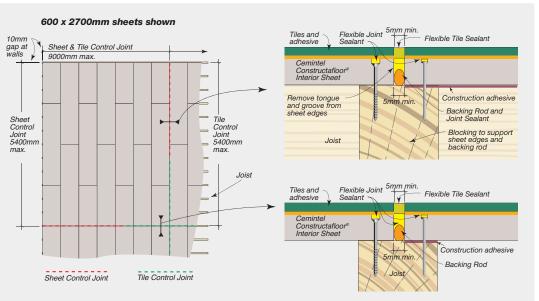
Typical Sheet & Control Joint Layout – Staggered & Direct Fix Tile System shown
